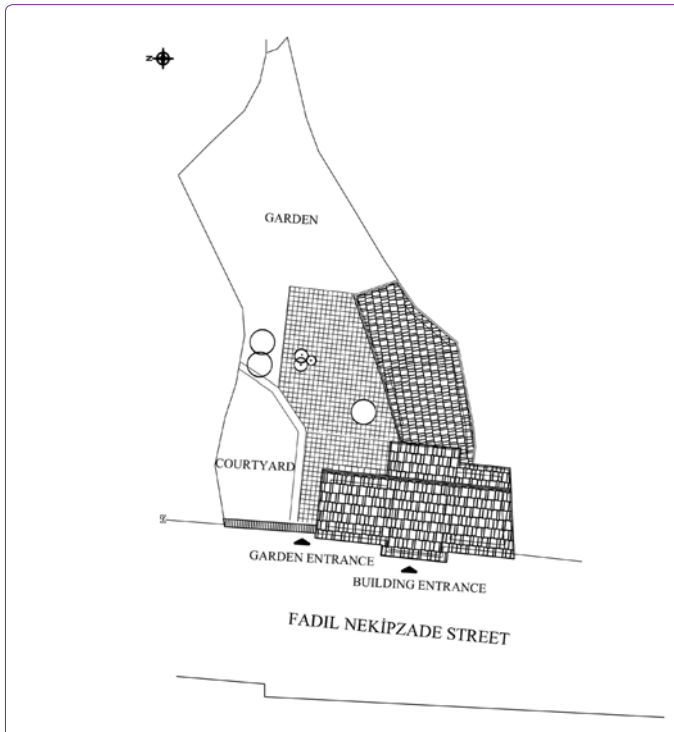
Building plot – building relationship, site plan. Source: Makbule Oktay, December 2018.
